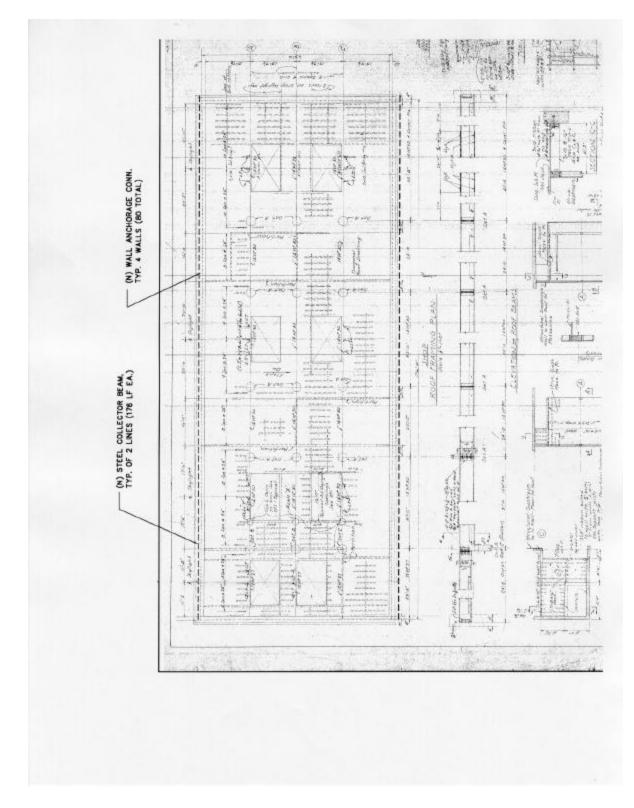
Gymnasium Building, Low Roof Framing Plan
